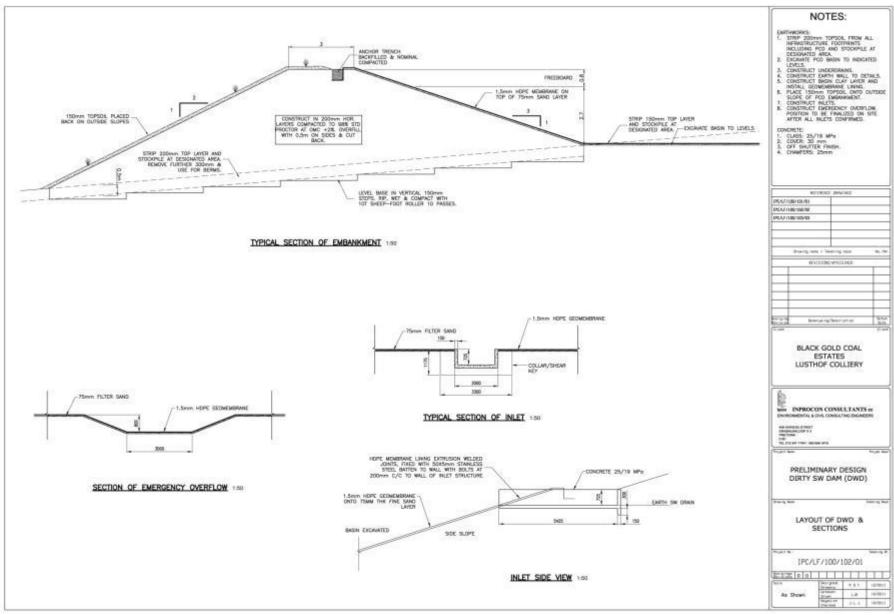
(b): Dirty Water Dam - Typical Embankment, Inlet and Overflow Details.
